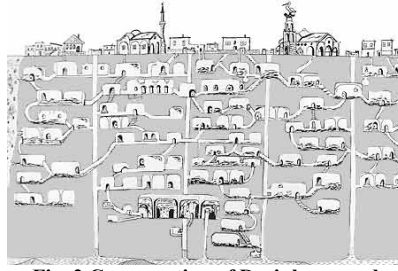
Cross-section of Derinkuyu underground city (avanos evi, 2011)
